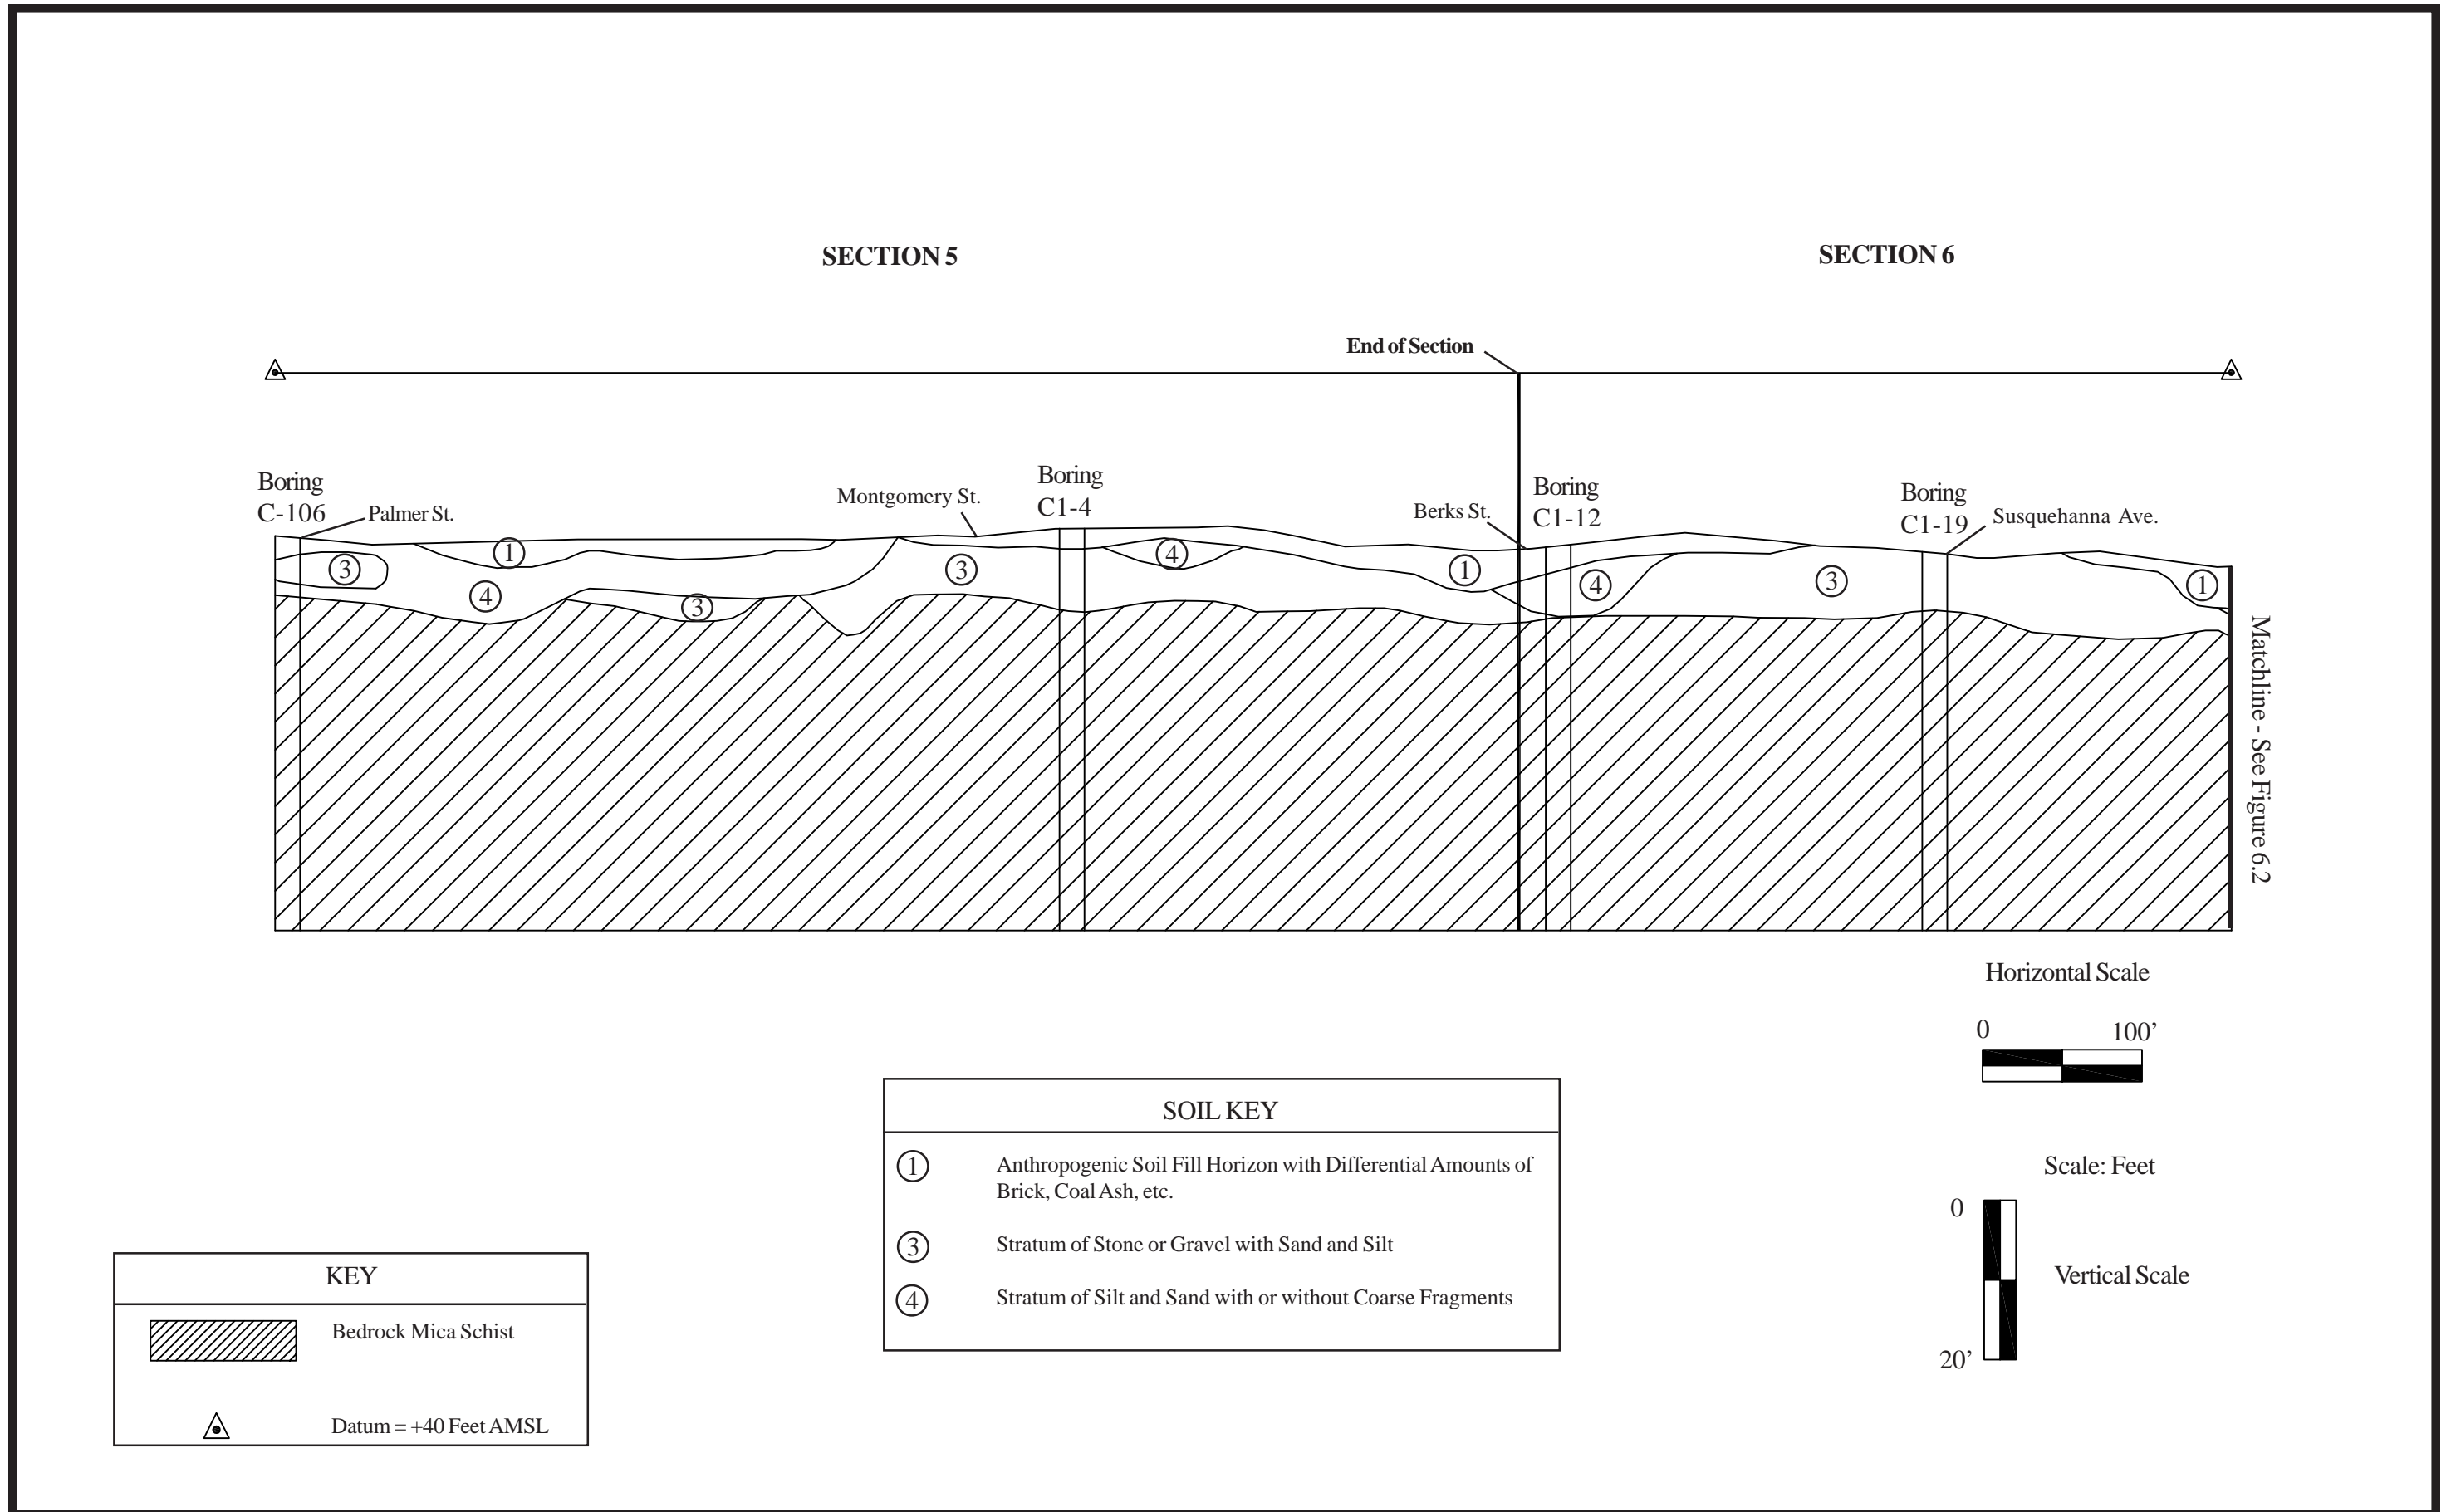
Section 5, Soil Profile, Stations 325+00 to 333+00, Palmer Street to Berks Street, and Portion of Section 6.
